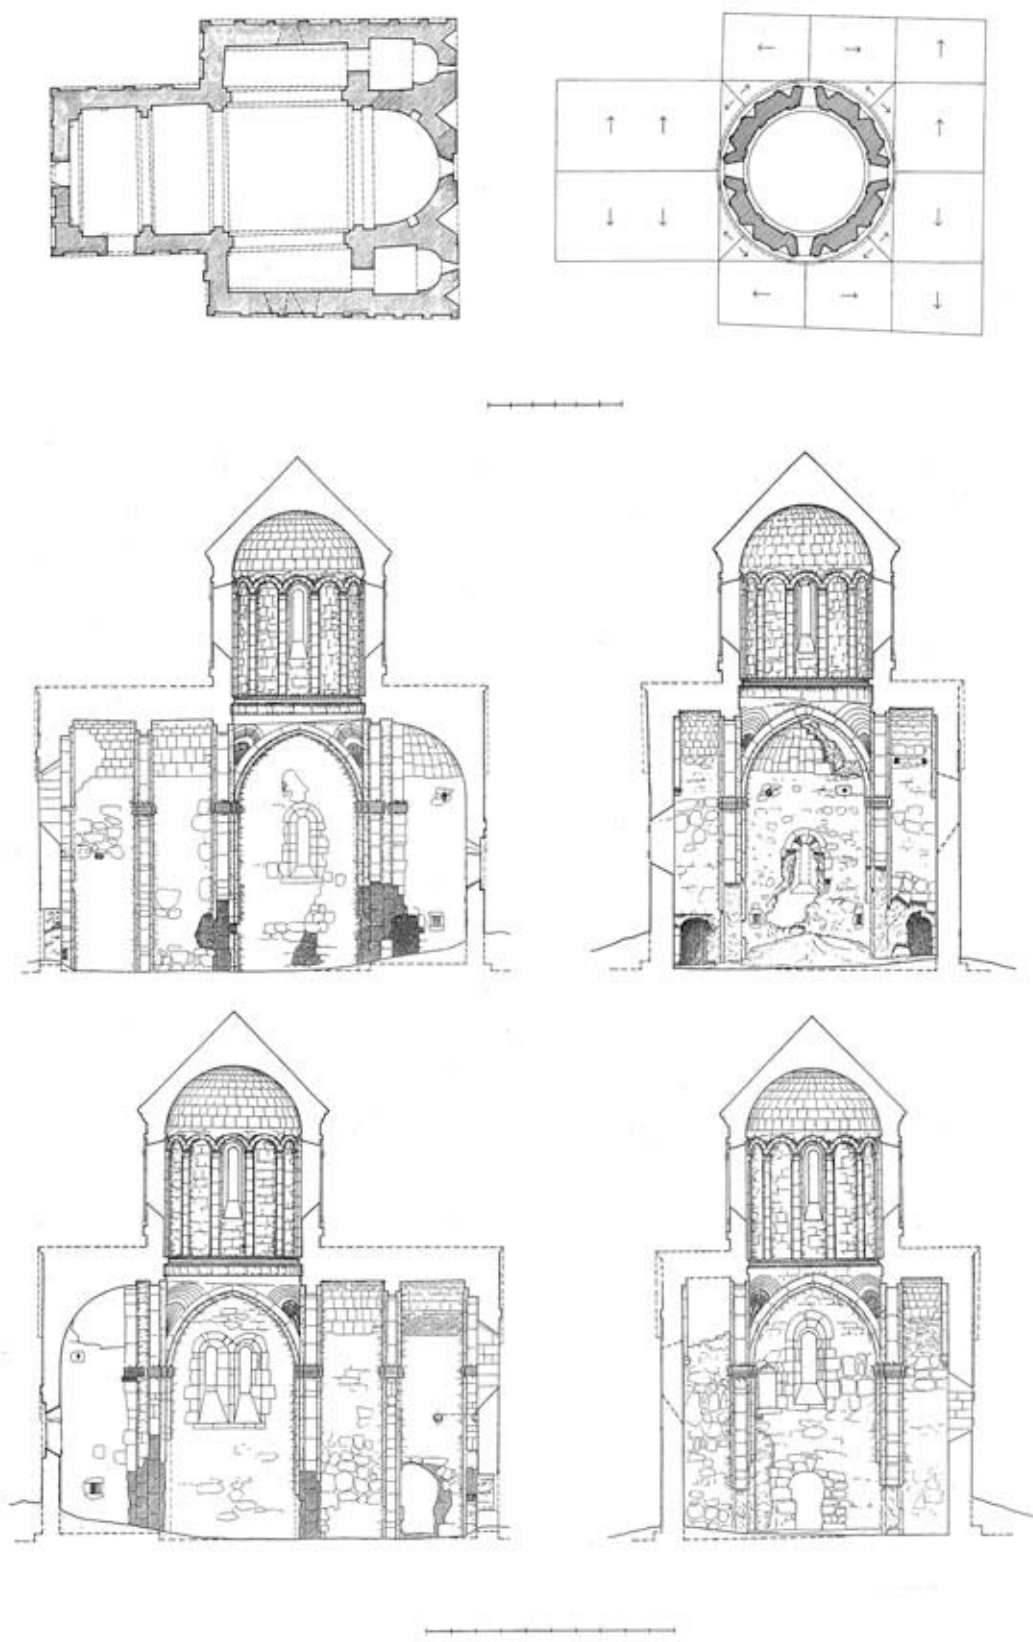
Yeni Rabat (Shatberdi). Ground plan, roofing plan, and sections
